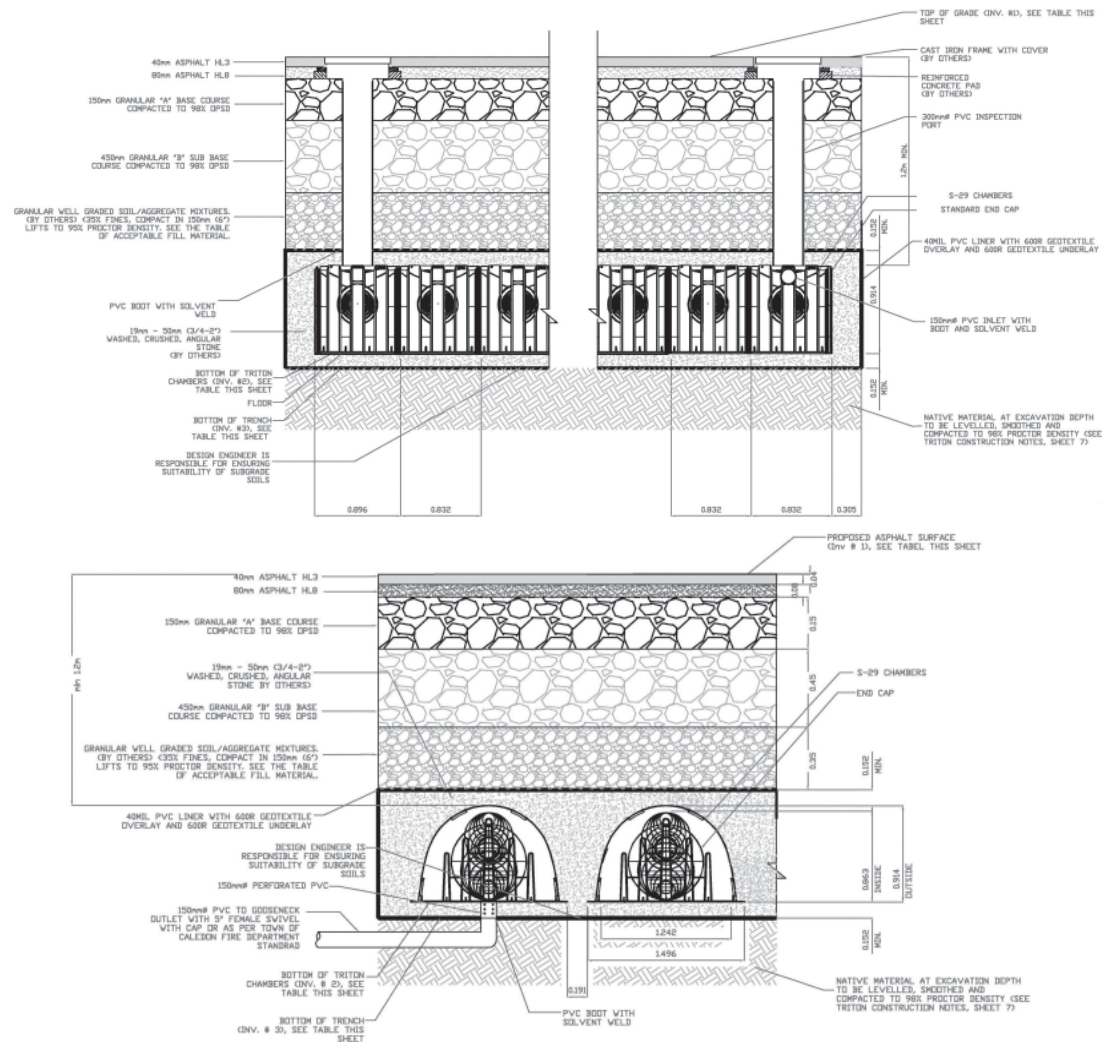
A cross-section detail of a proprietary rainwater harvesting unit installed at the Brampton Flight Centre (Source: Aquafor Beech & Terrafix)
